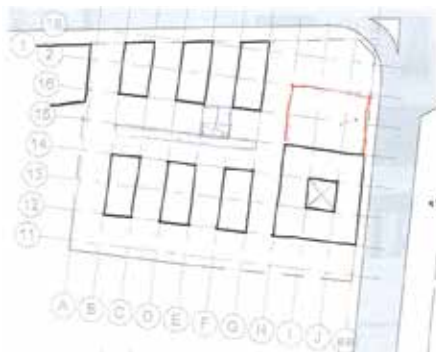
Initial plan exploration fourth to fifth floor
